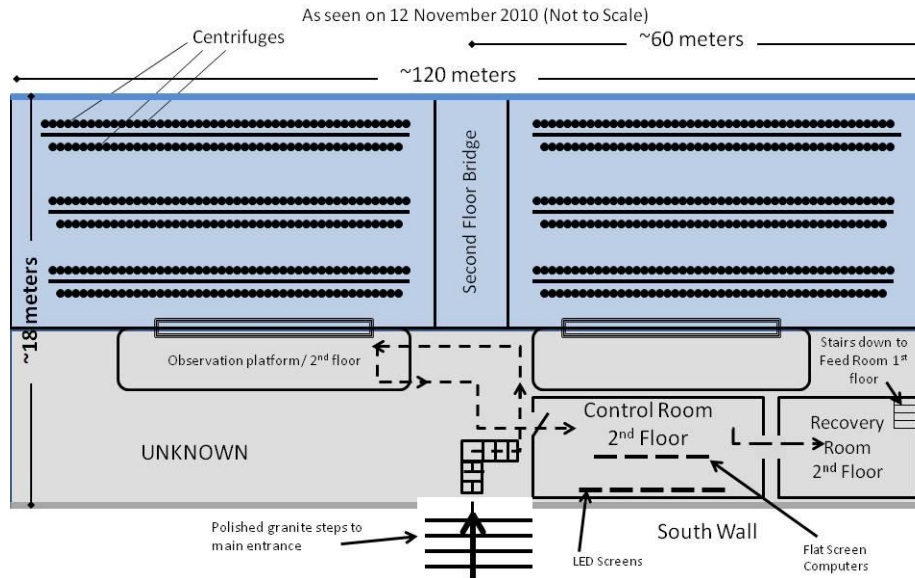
A rough schematic of the floor plan for the cascade hall at the uranium enrichment centrifuge facility (Building 4) in Yongbyon, as of Nov. 12, 2010.
